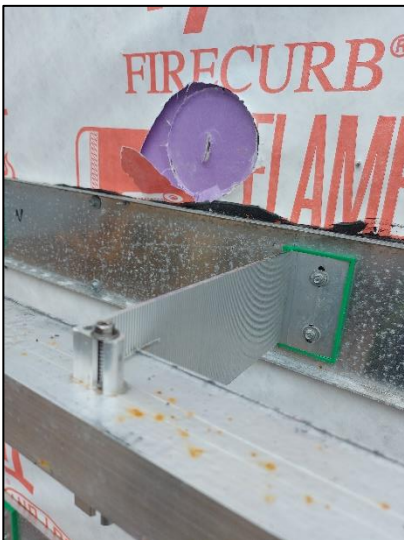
Window frame removed, and dry zone checked and found to be dry
